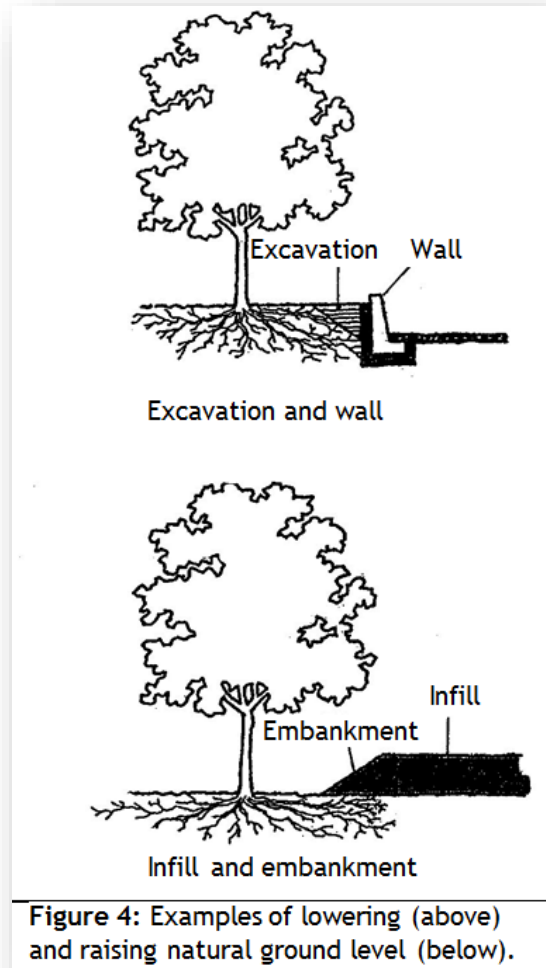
Examples of lowering (above) and raising natural ground level (below).
